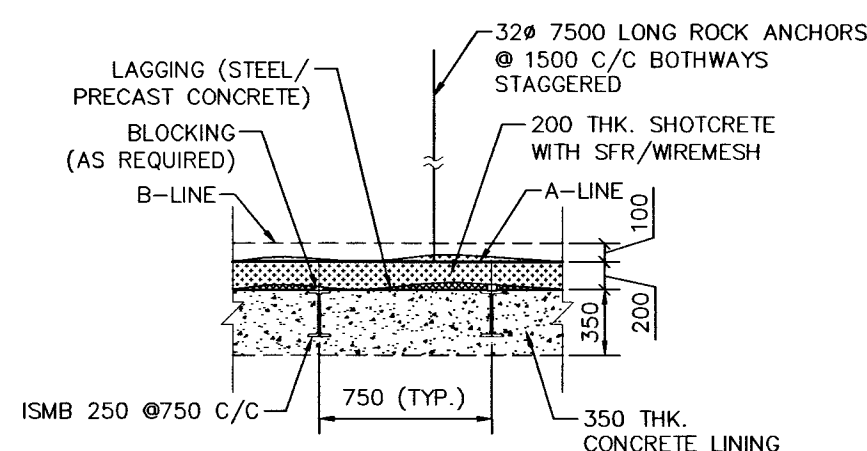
DETAIL (NTS)  (ROCK ANCHORS NOT SHOWN)
